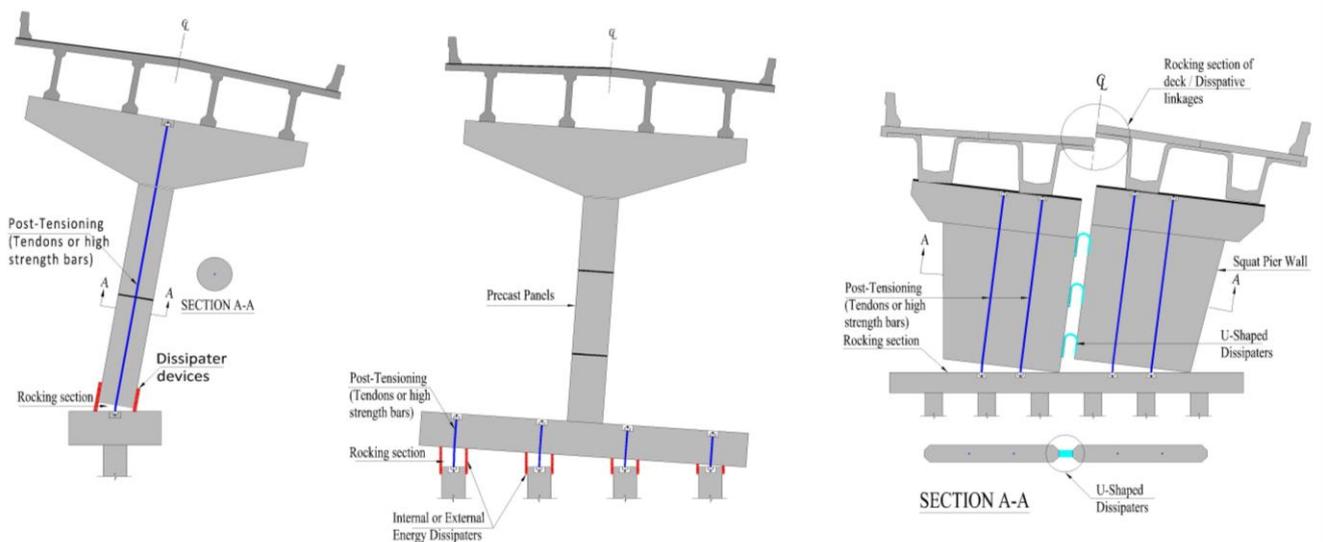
Controlled rocking of damage resistant bridge construction substructure: pier-to-foundation (left); foundation-to-piles (middle); coupled rocking pier-to-foundation (right).
